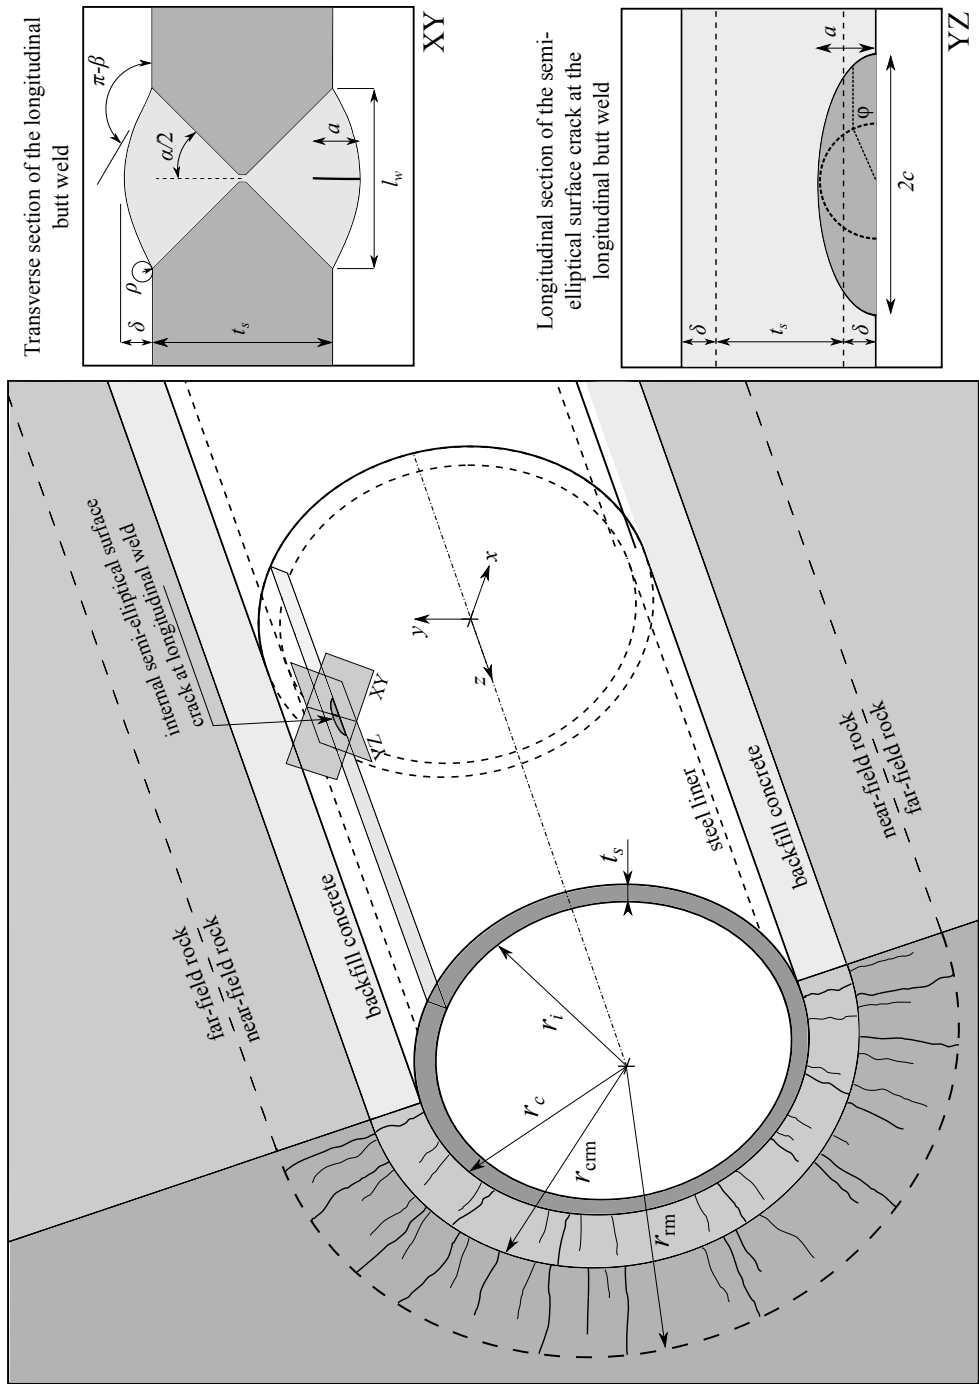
Definition sketch of a steel-lined pressure tunnel or shaft with an axial semi-elliptical surface crack at the longitudinal butt welded joint, on the internal surface. The slenderness of the steel liner is distorted for the sake of presentation.
